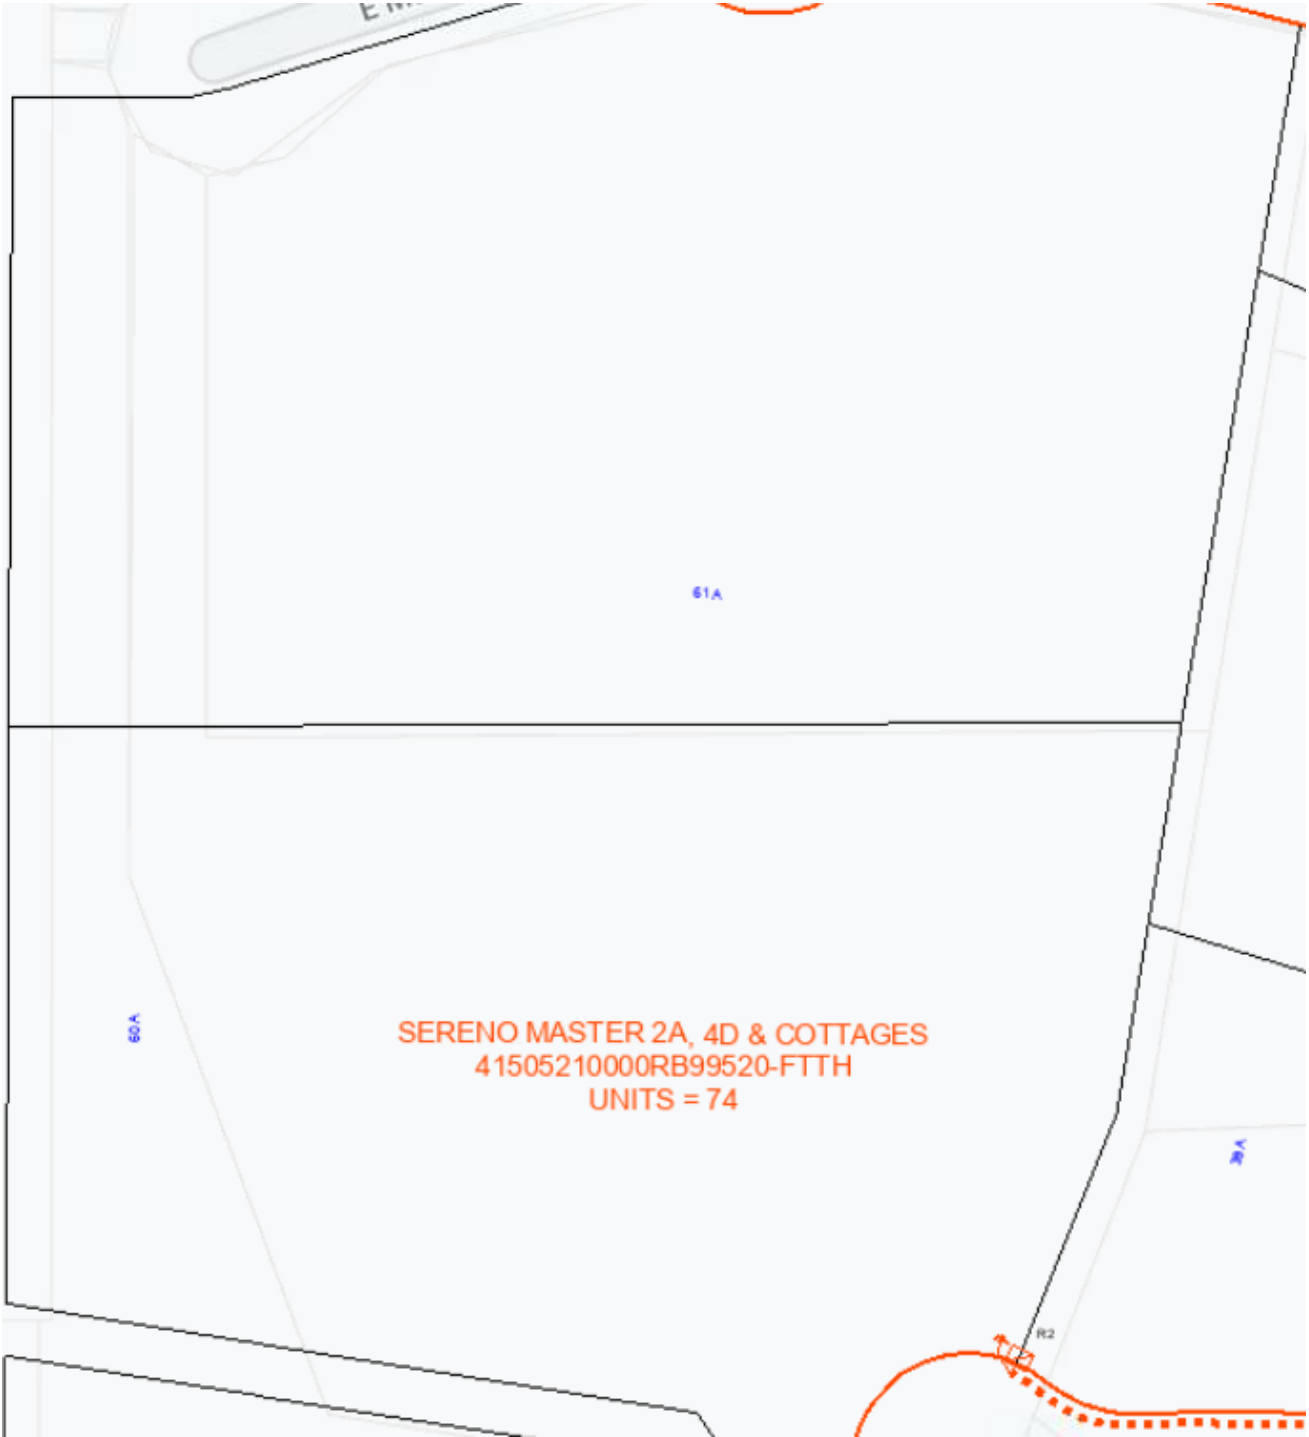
UNDERGROUND FACILITIES ON THE NORTH SIDE OF BLACK ROCK RD
